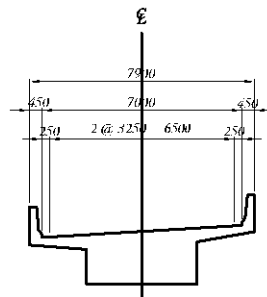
Typical Cross Section for Ramp (Temporary 2-lane, Bridge)
